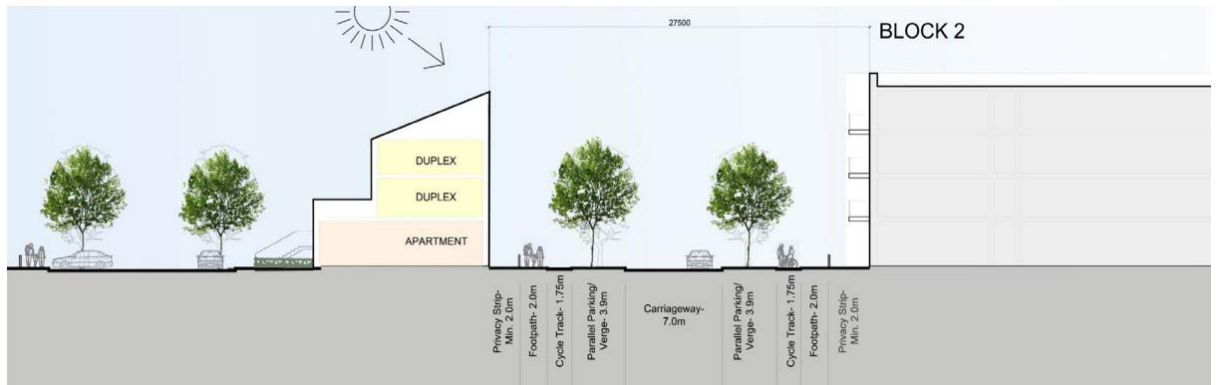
INDICATIVE LINK STREET / AVENUE SECTION
